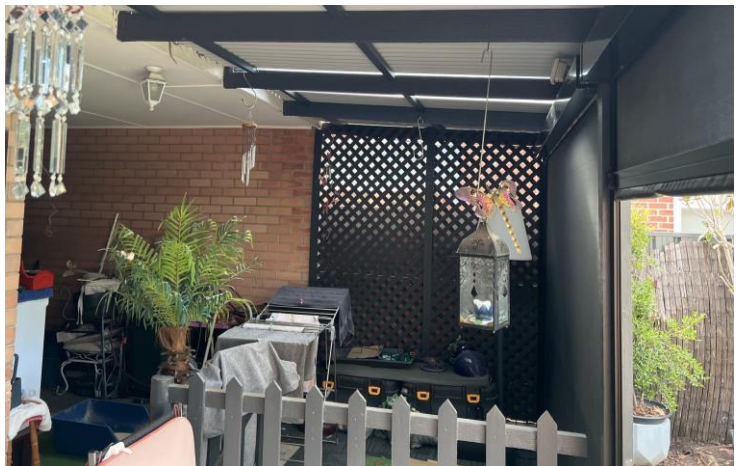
View of proposed location of boundary wall taken from verandah area of adjacent dwelling at 4 Beadnall Tce.
